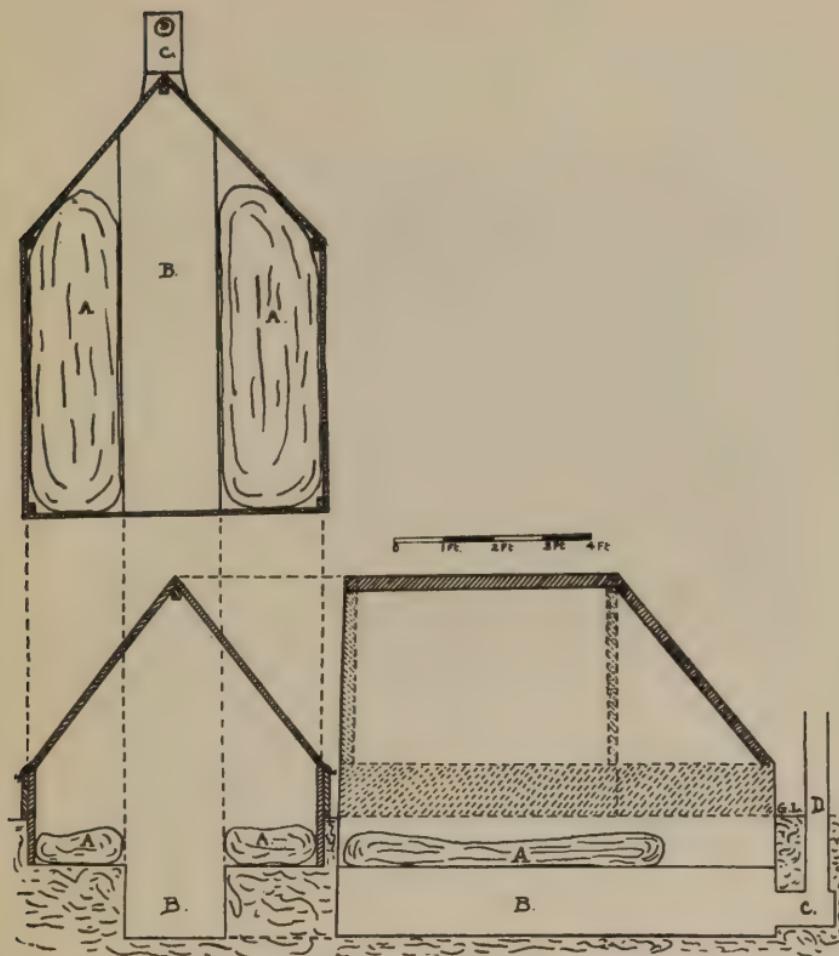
Dugout with shelter tent roof. A, Bunks; B, trench; C, stove; D, chimney. (*Lake.*)
